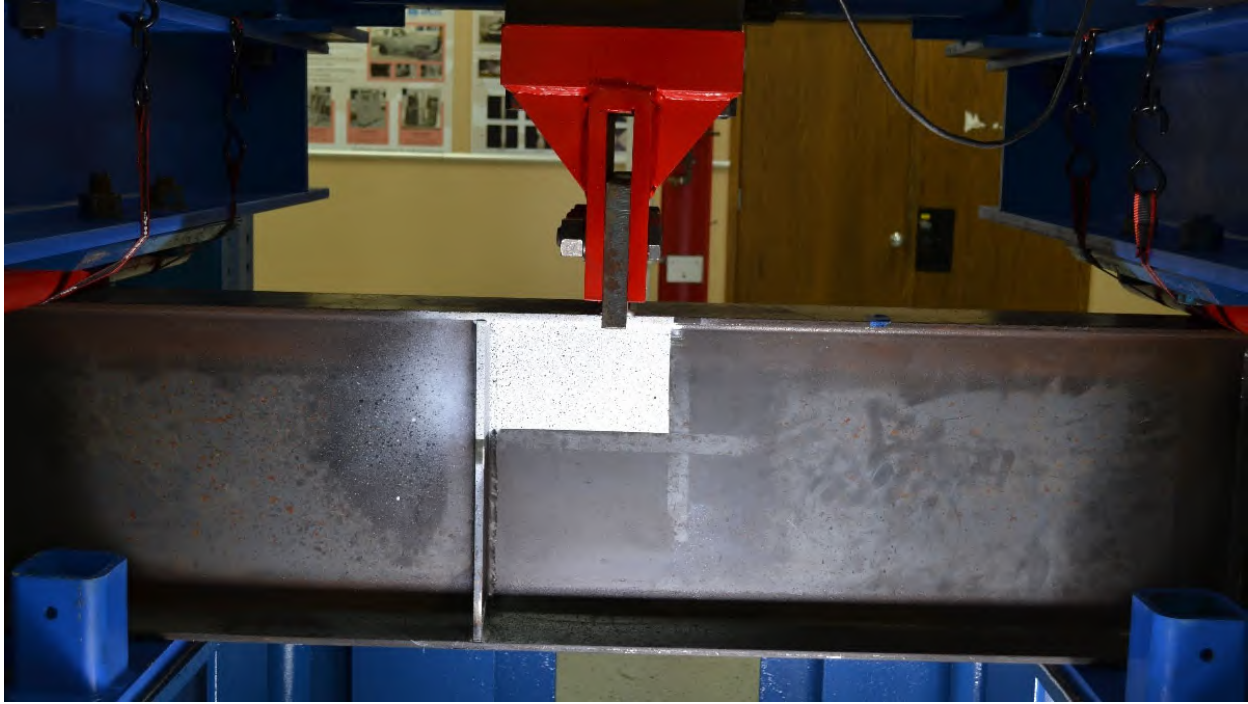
Close-up view of W16X31-ST-NA after testing
